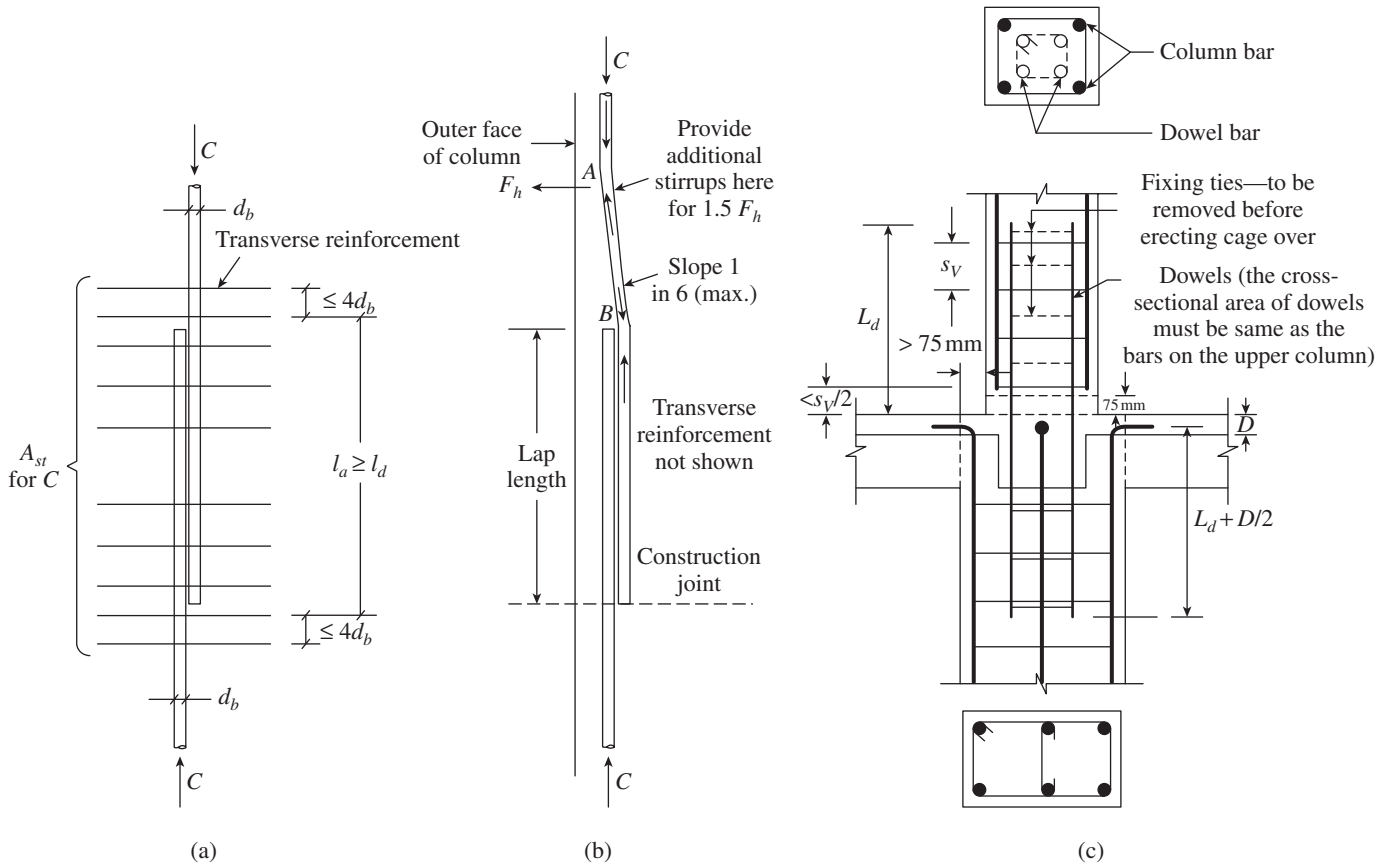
Transverse reinforcement for compression splices (a) Straight bars (b) Cranked bars (c) Splicing when column faces are offset by more than 75 mm
